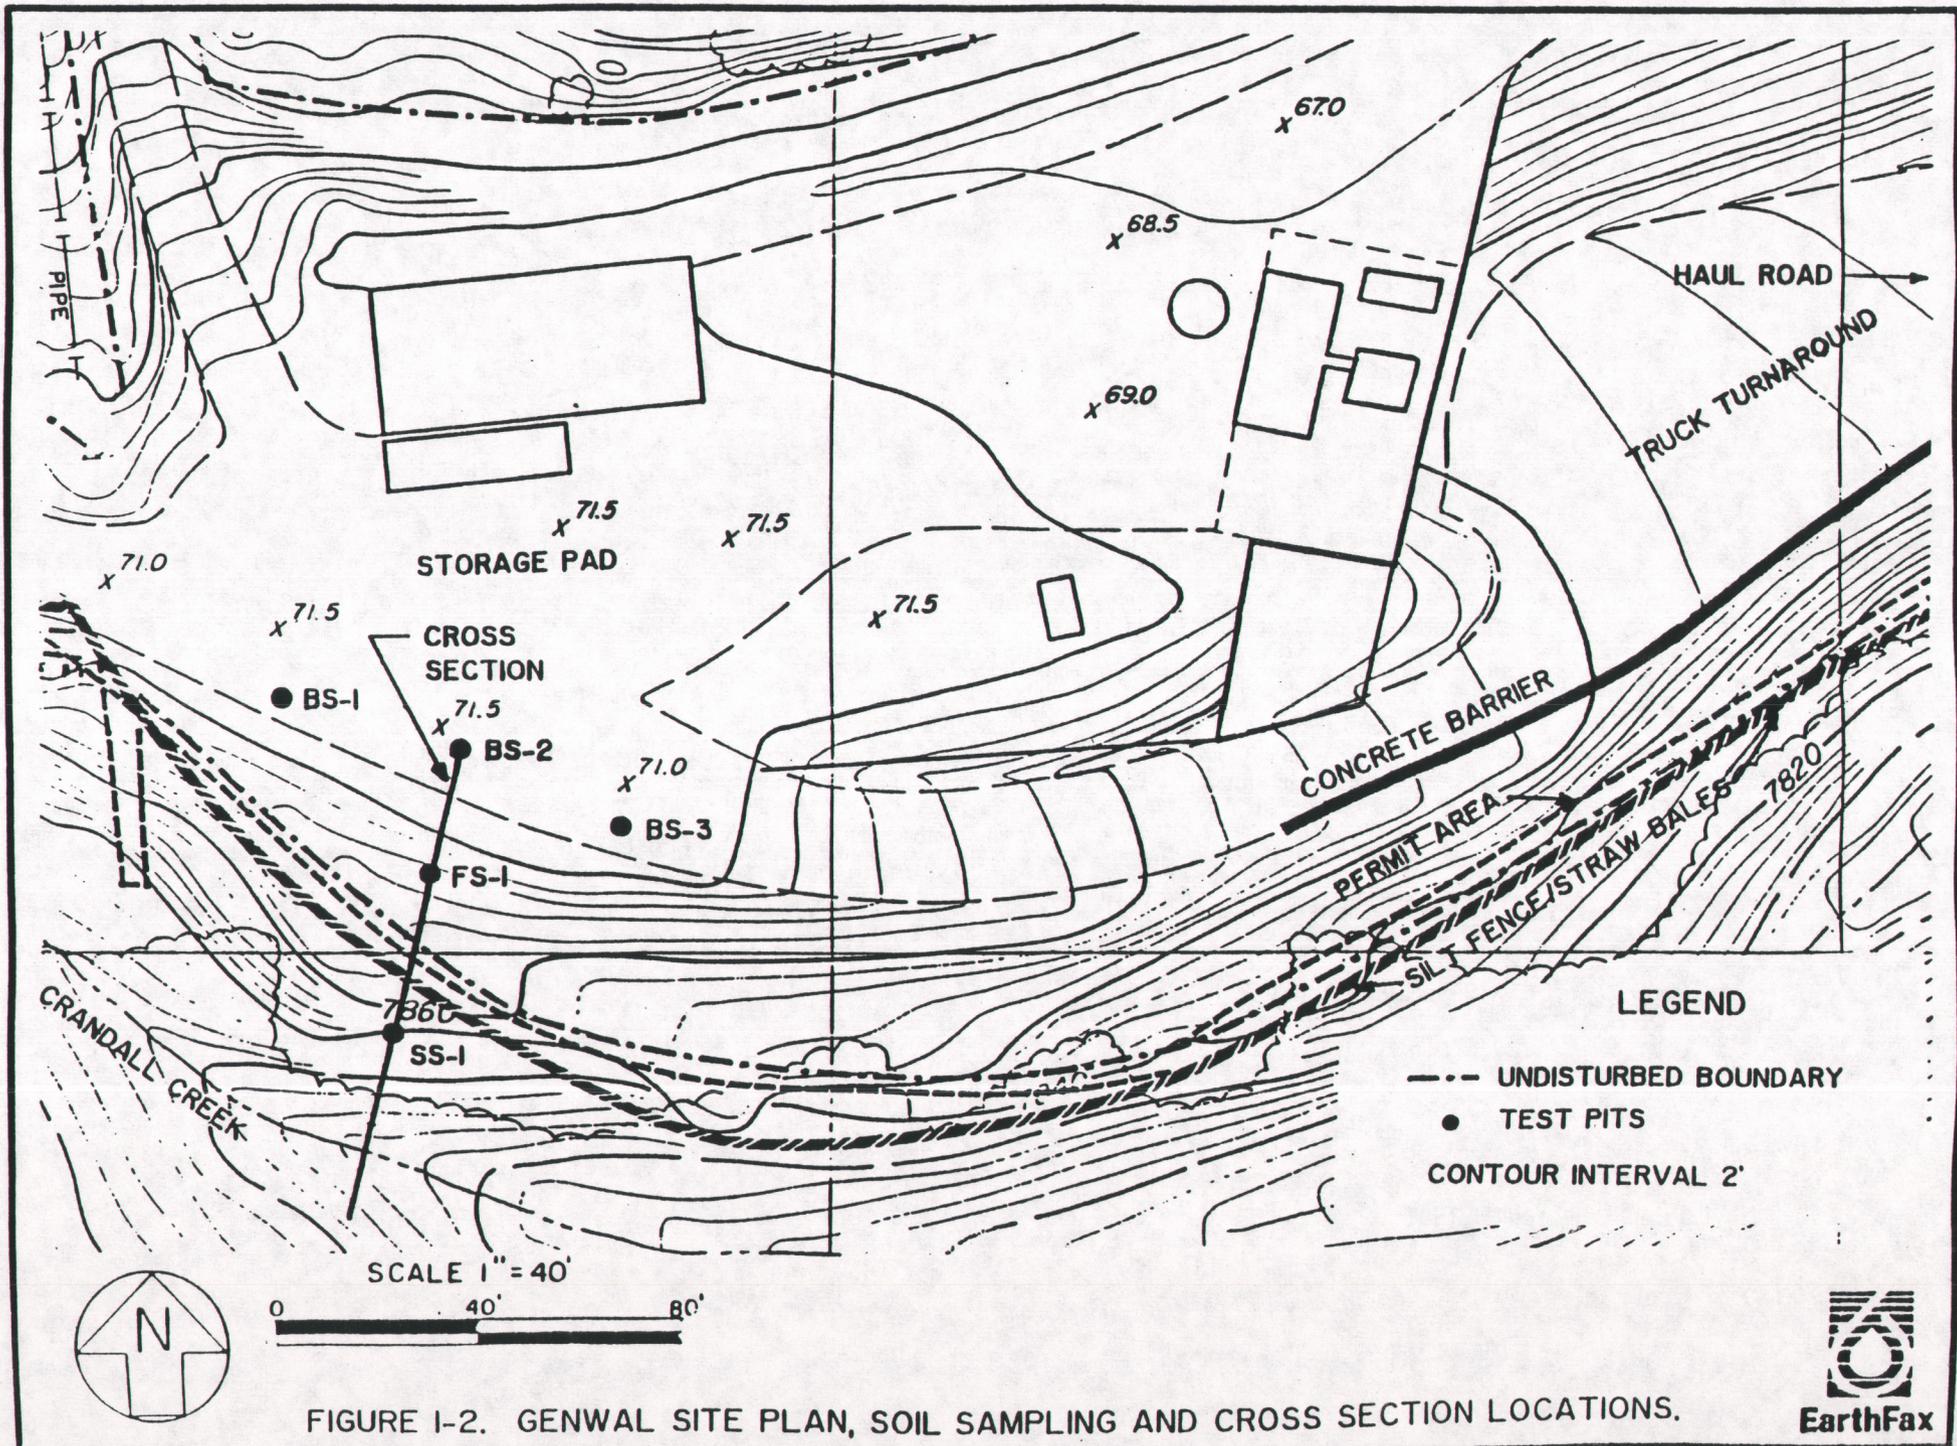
GENWAL SITE PLAN, SOIL SAMPLING AND CROSS SECTION LOCATIONS.
